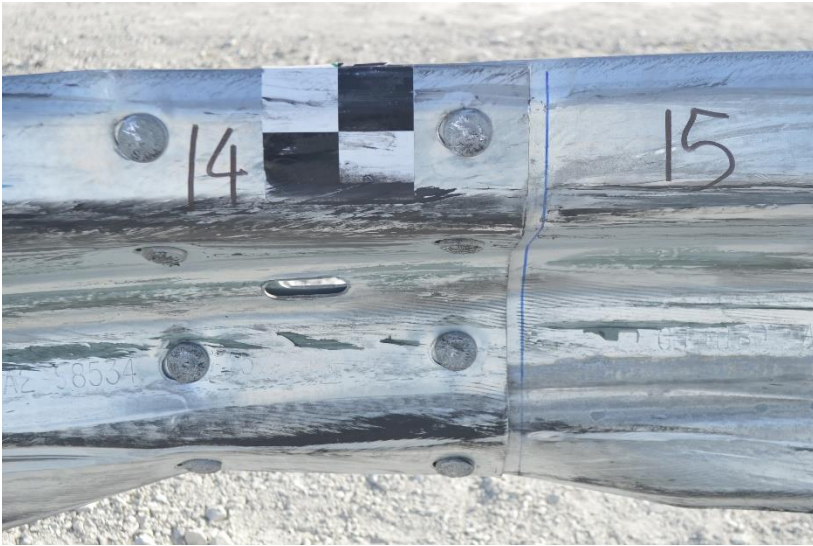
System Damage, Guardrail at Post Nos. 14 through 17, Test No. MGSC-8
